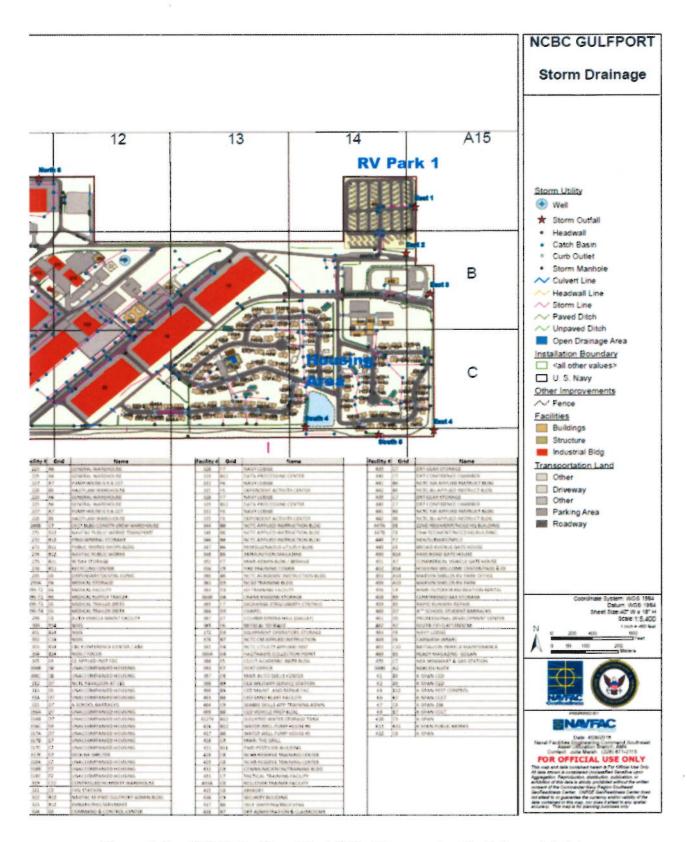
NCBC Gulfport East Side: Stormwater Outfalls and Inlet
